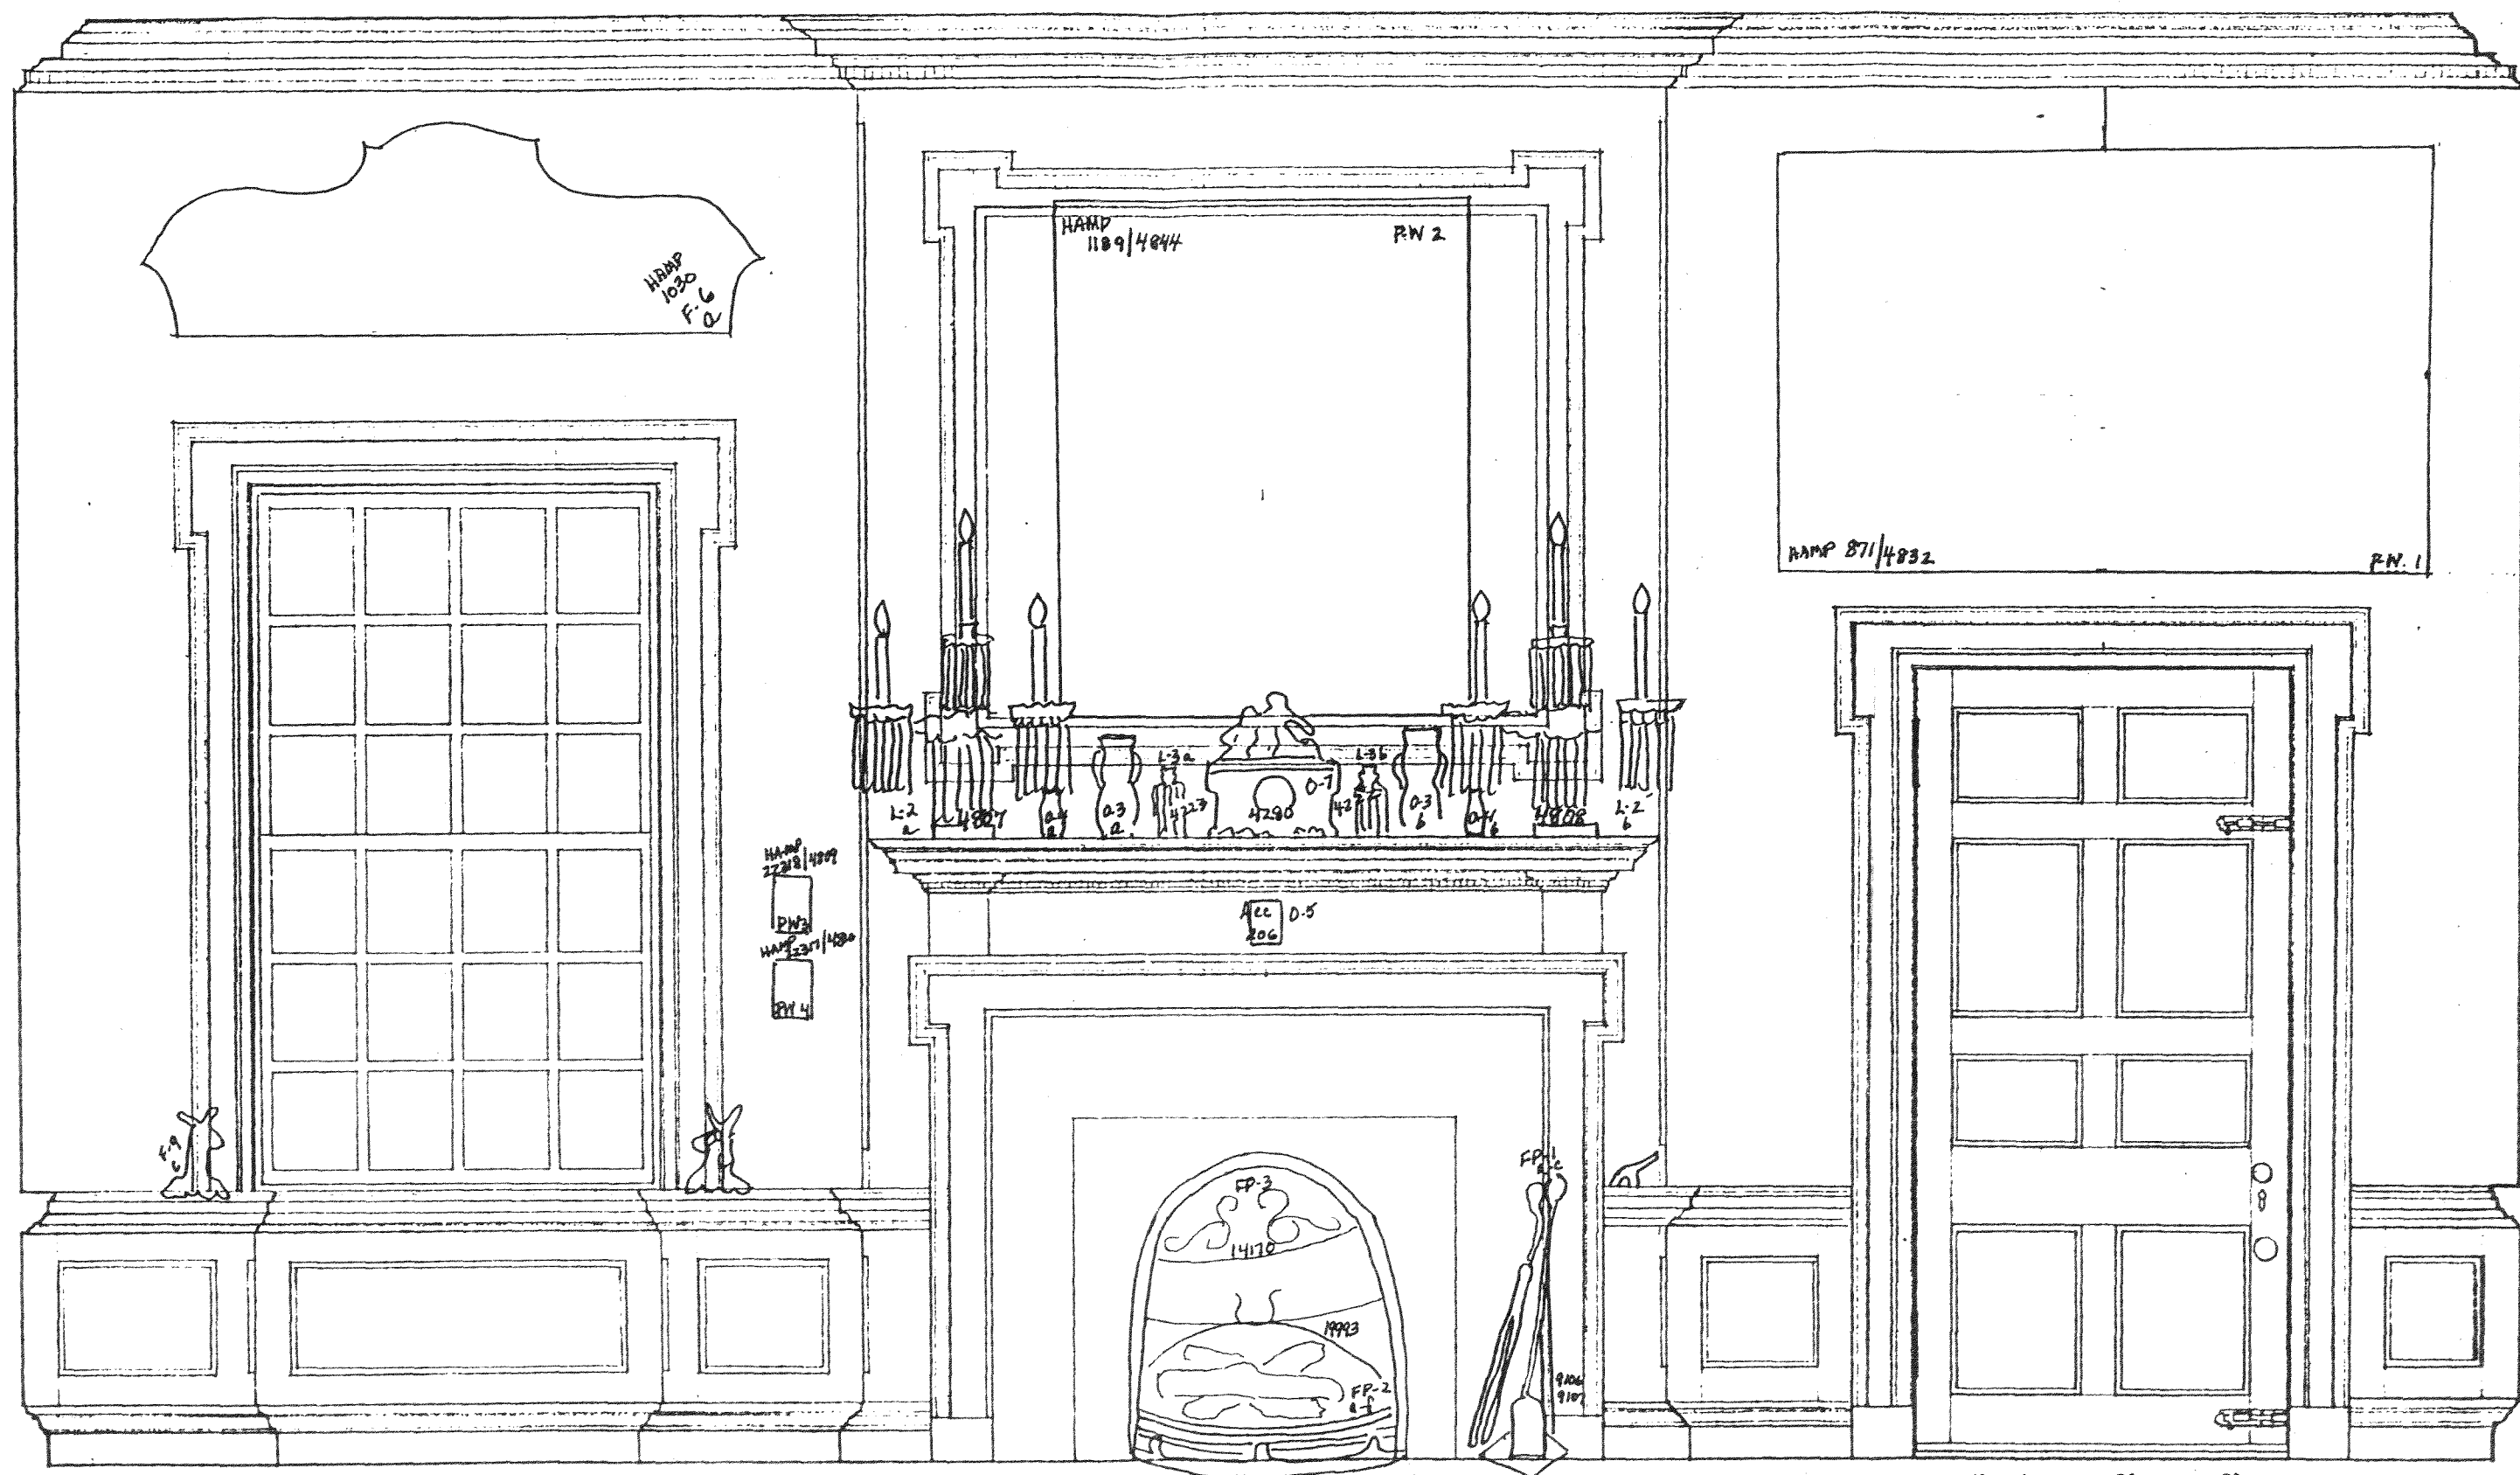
Sample furnishing plan, Music Room, West elevation.
